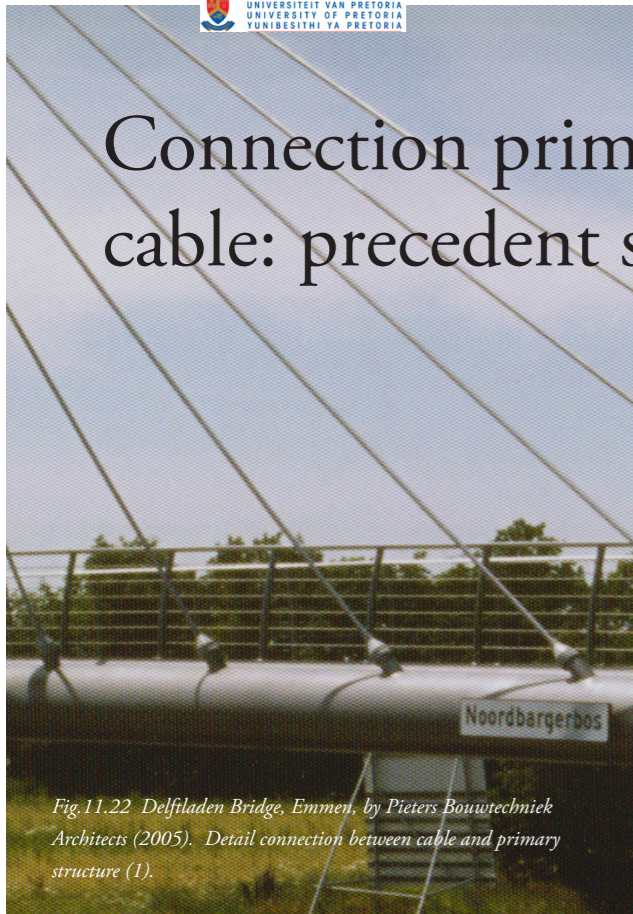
Delfiladen Bridge, Emmen, by Pieters Bouwtechniek Architects (2005). Detail connection between cable and primary structure (1).
